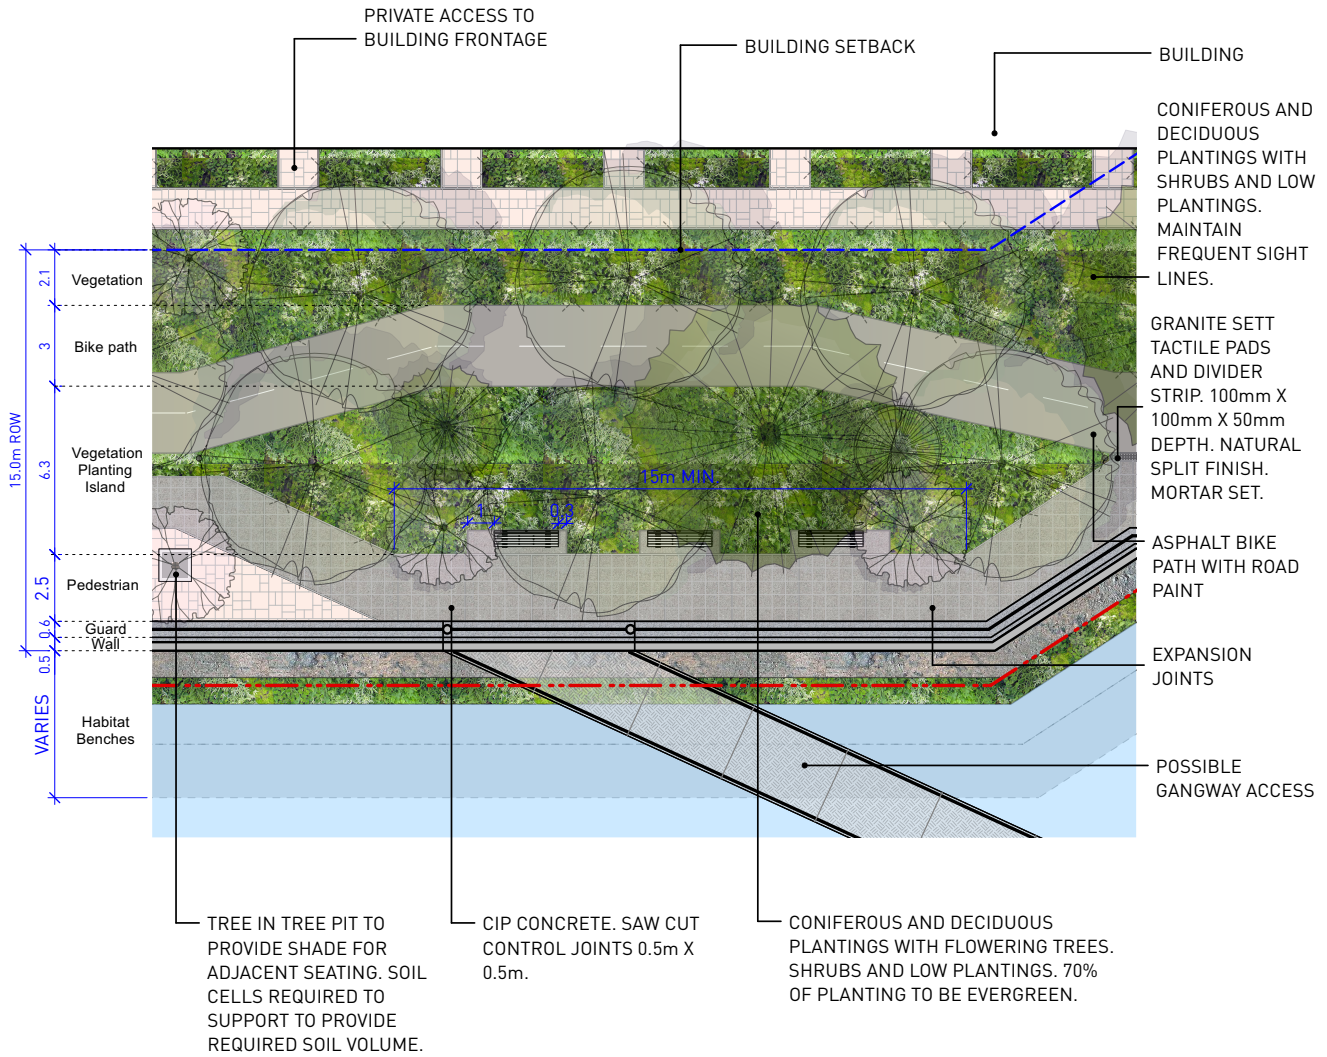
ENLARGEMENT 2 - MAJOR ACCESS
